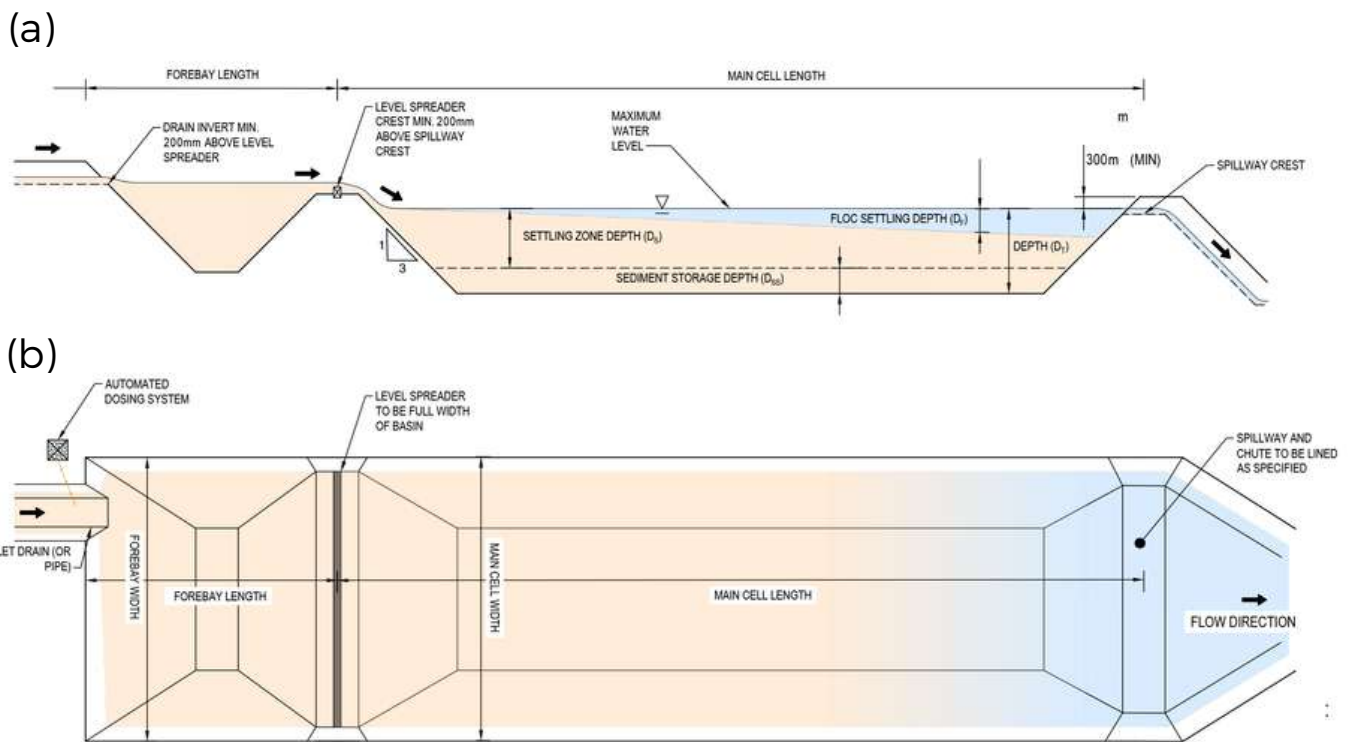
Technical diagrams indicating the dimensions and construction details of a Type B sediment basin in (a) cross-section and (b) plan views. Not to scale.
